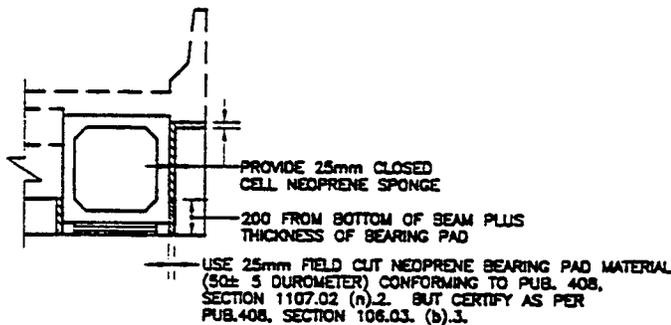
Cast-In-Place Slab Depressed Shear Key Details
